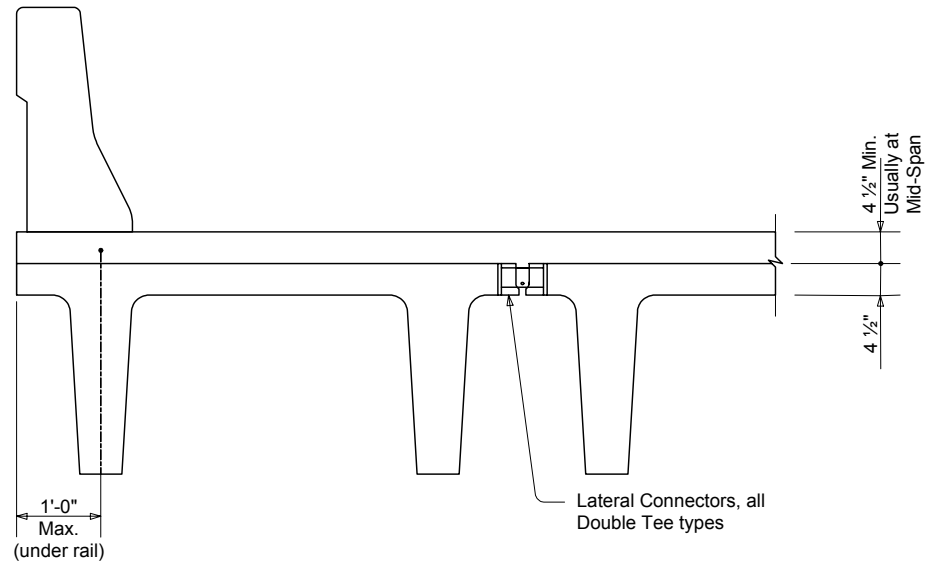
Prestressed Double Tee Beam Typical Section
